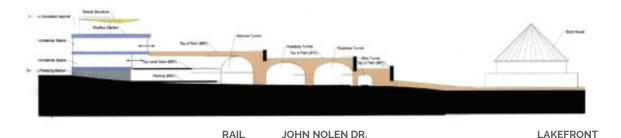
DESIGN TEAM THREE: FULL BUILDOUT CONCEPT
